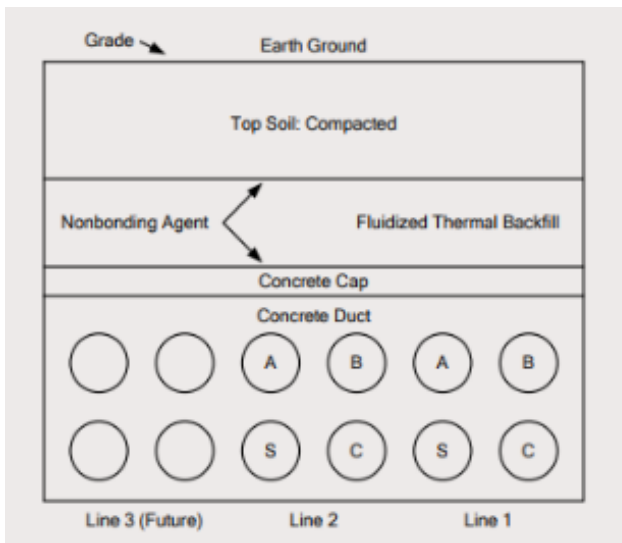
Underground Cable Trench Configuration (D. Bucco et al. [6])
